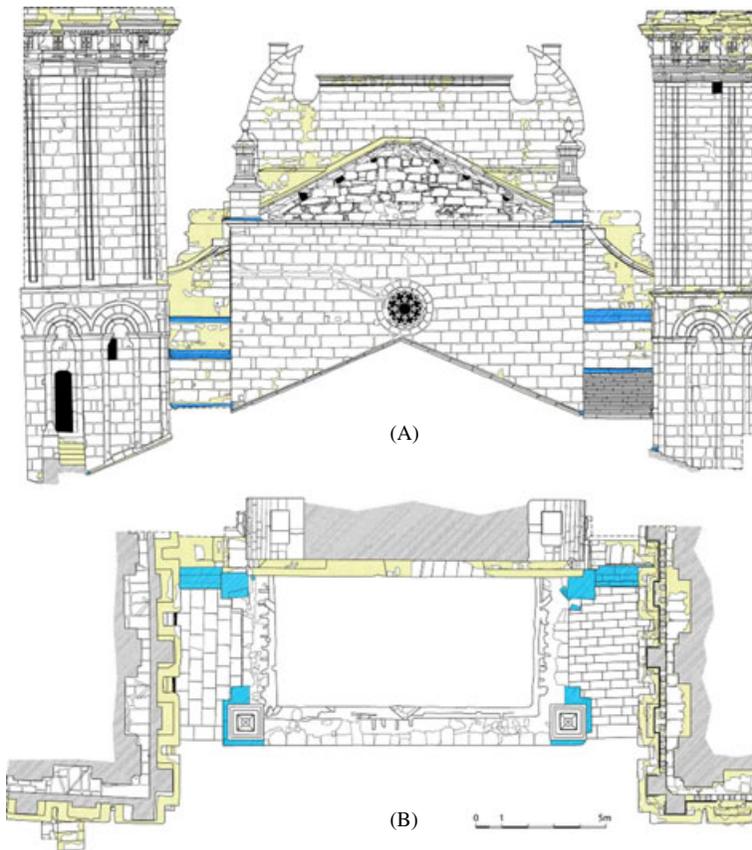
Complete photogrammetric restitution of the working area on the roofs of the cathedral. A shows the elevation and B the floor plans. The south tower is on the left and the north tower on the right.
